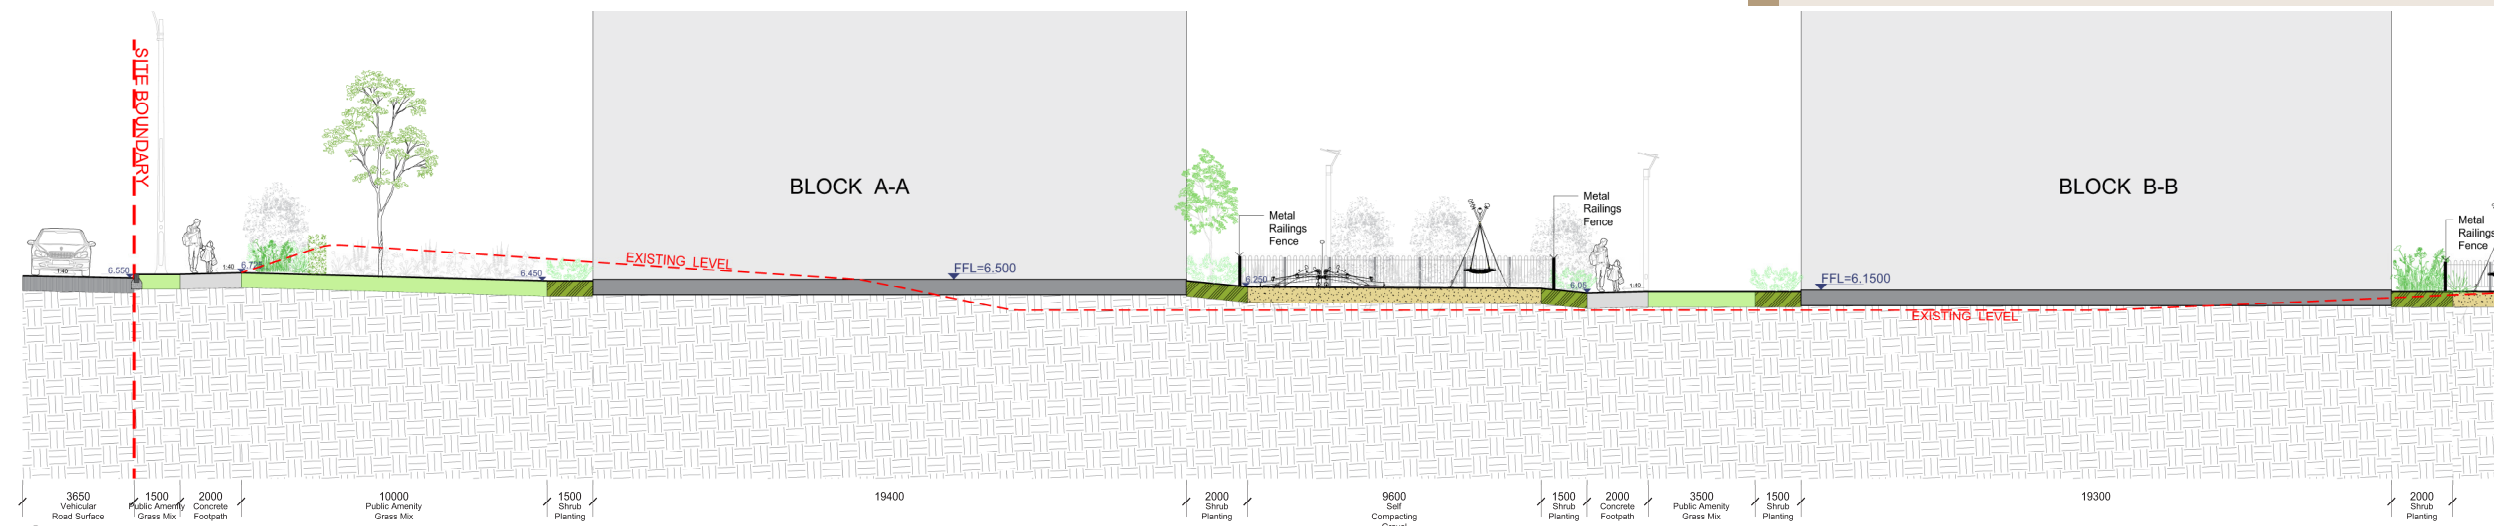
Proposed Landscaping Site Section AA, Open Space between Blocks A and B through creche external play space , from CSR drawing no. 25154-2-201
